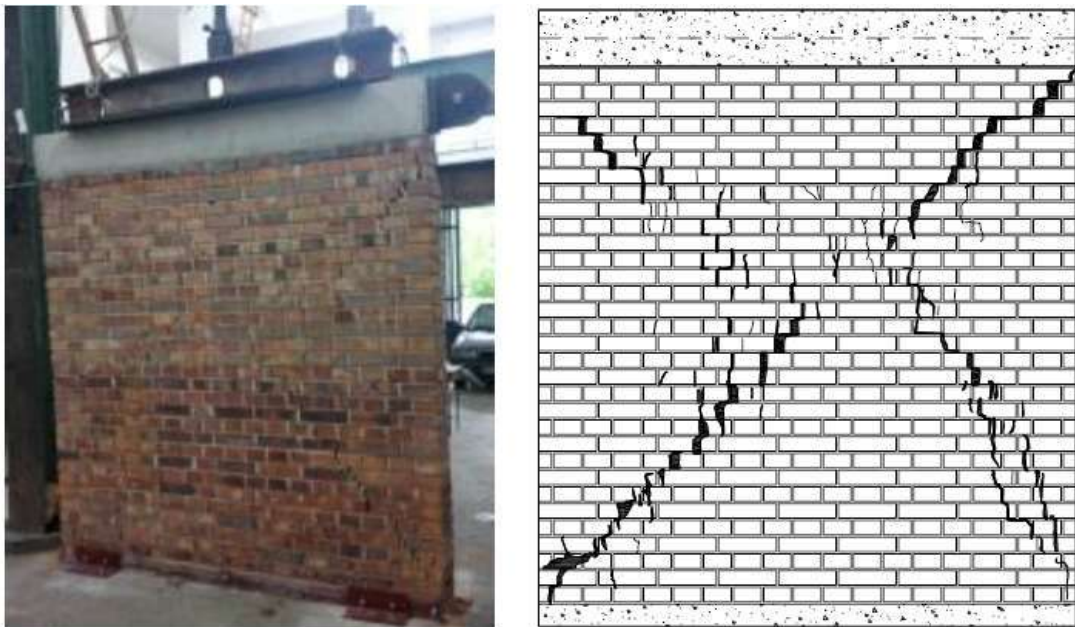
Crack patterns and crack width of URM walls (Mustafa et al., 2018)
